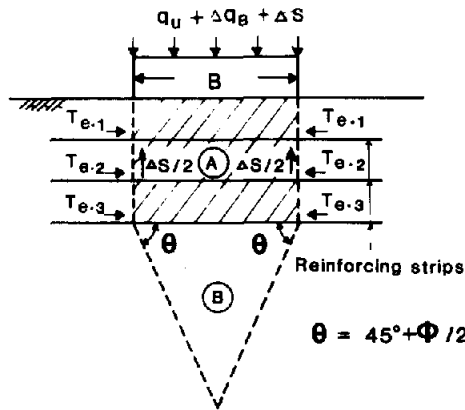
Side wall friction for long reinforcement in Failure mode-1.
